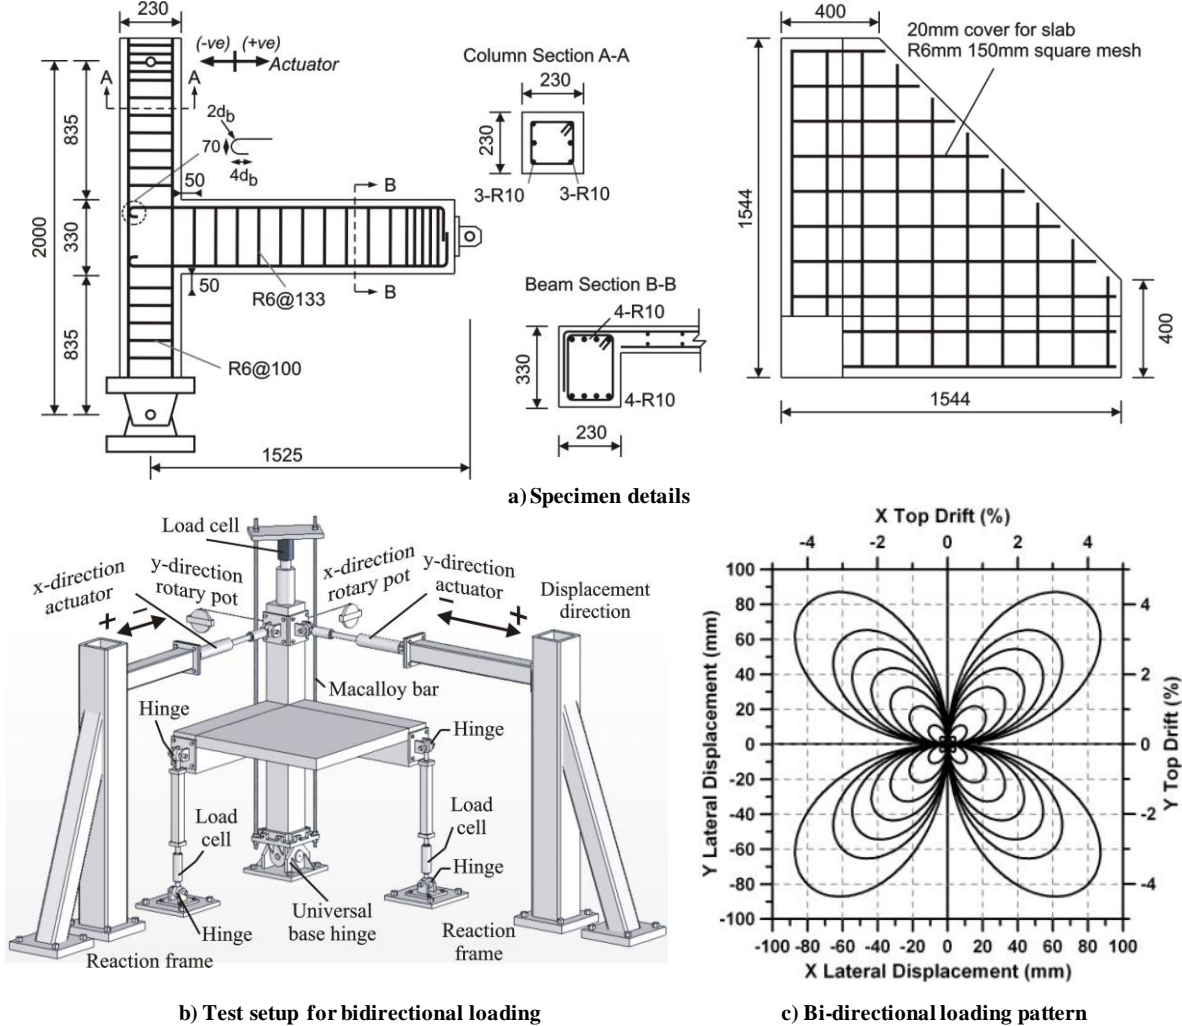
Specimen details, test setup and loading pattern (all dimensions in mm)
